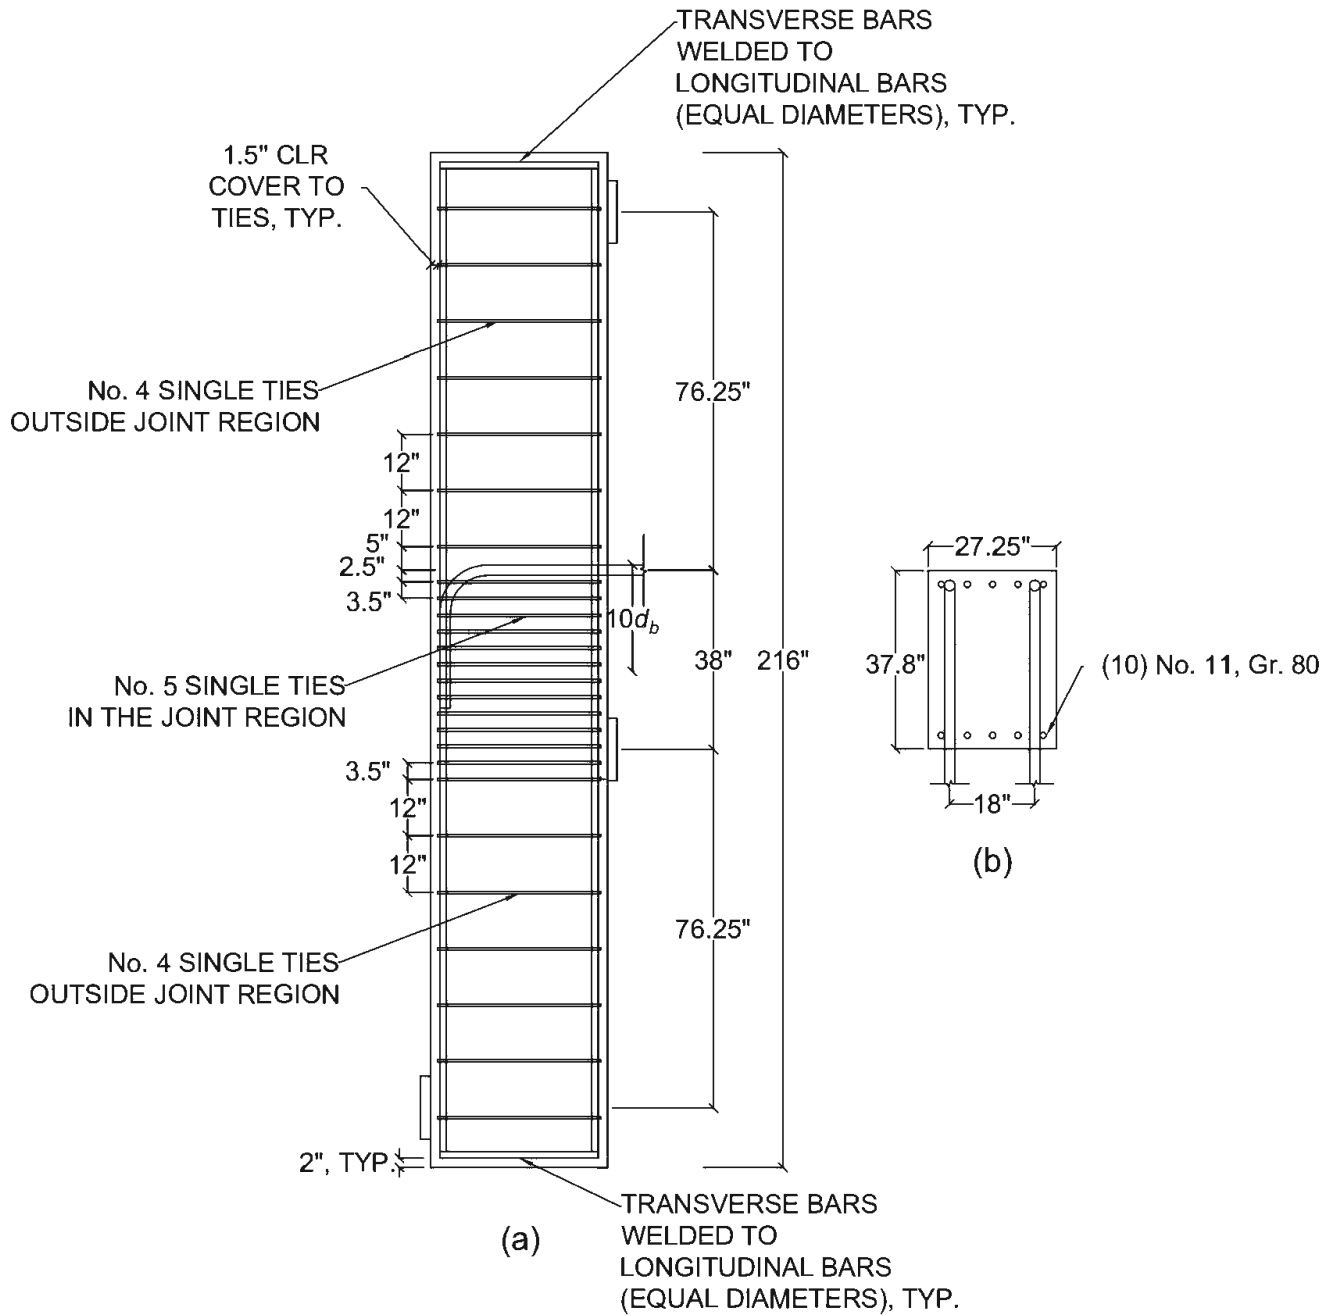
Details of reinforcement layout for No. 18 hooked bar specimen H18-4: (a) elevation, (b) cross-section
